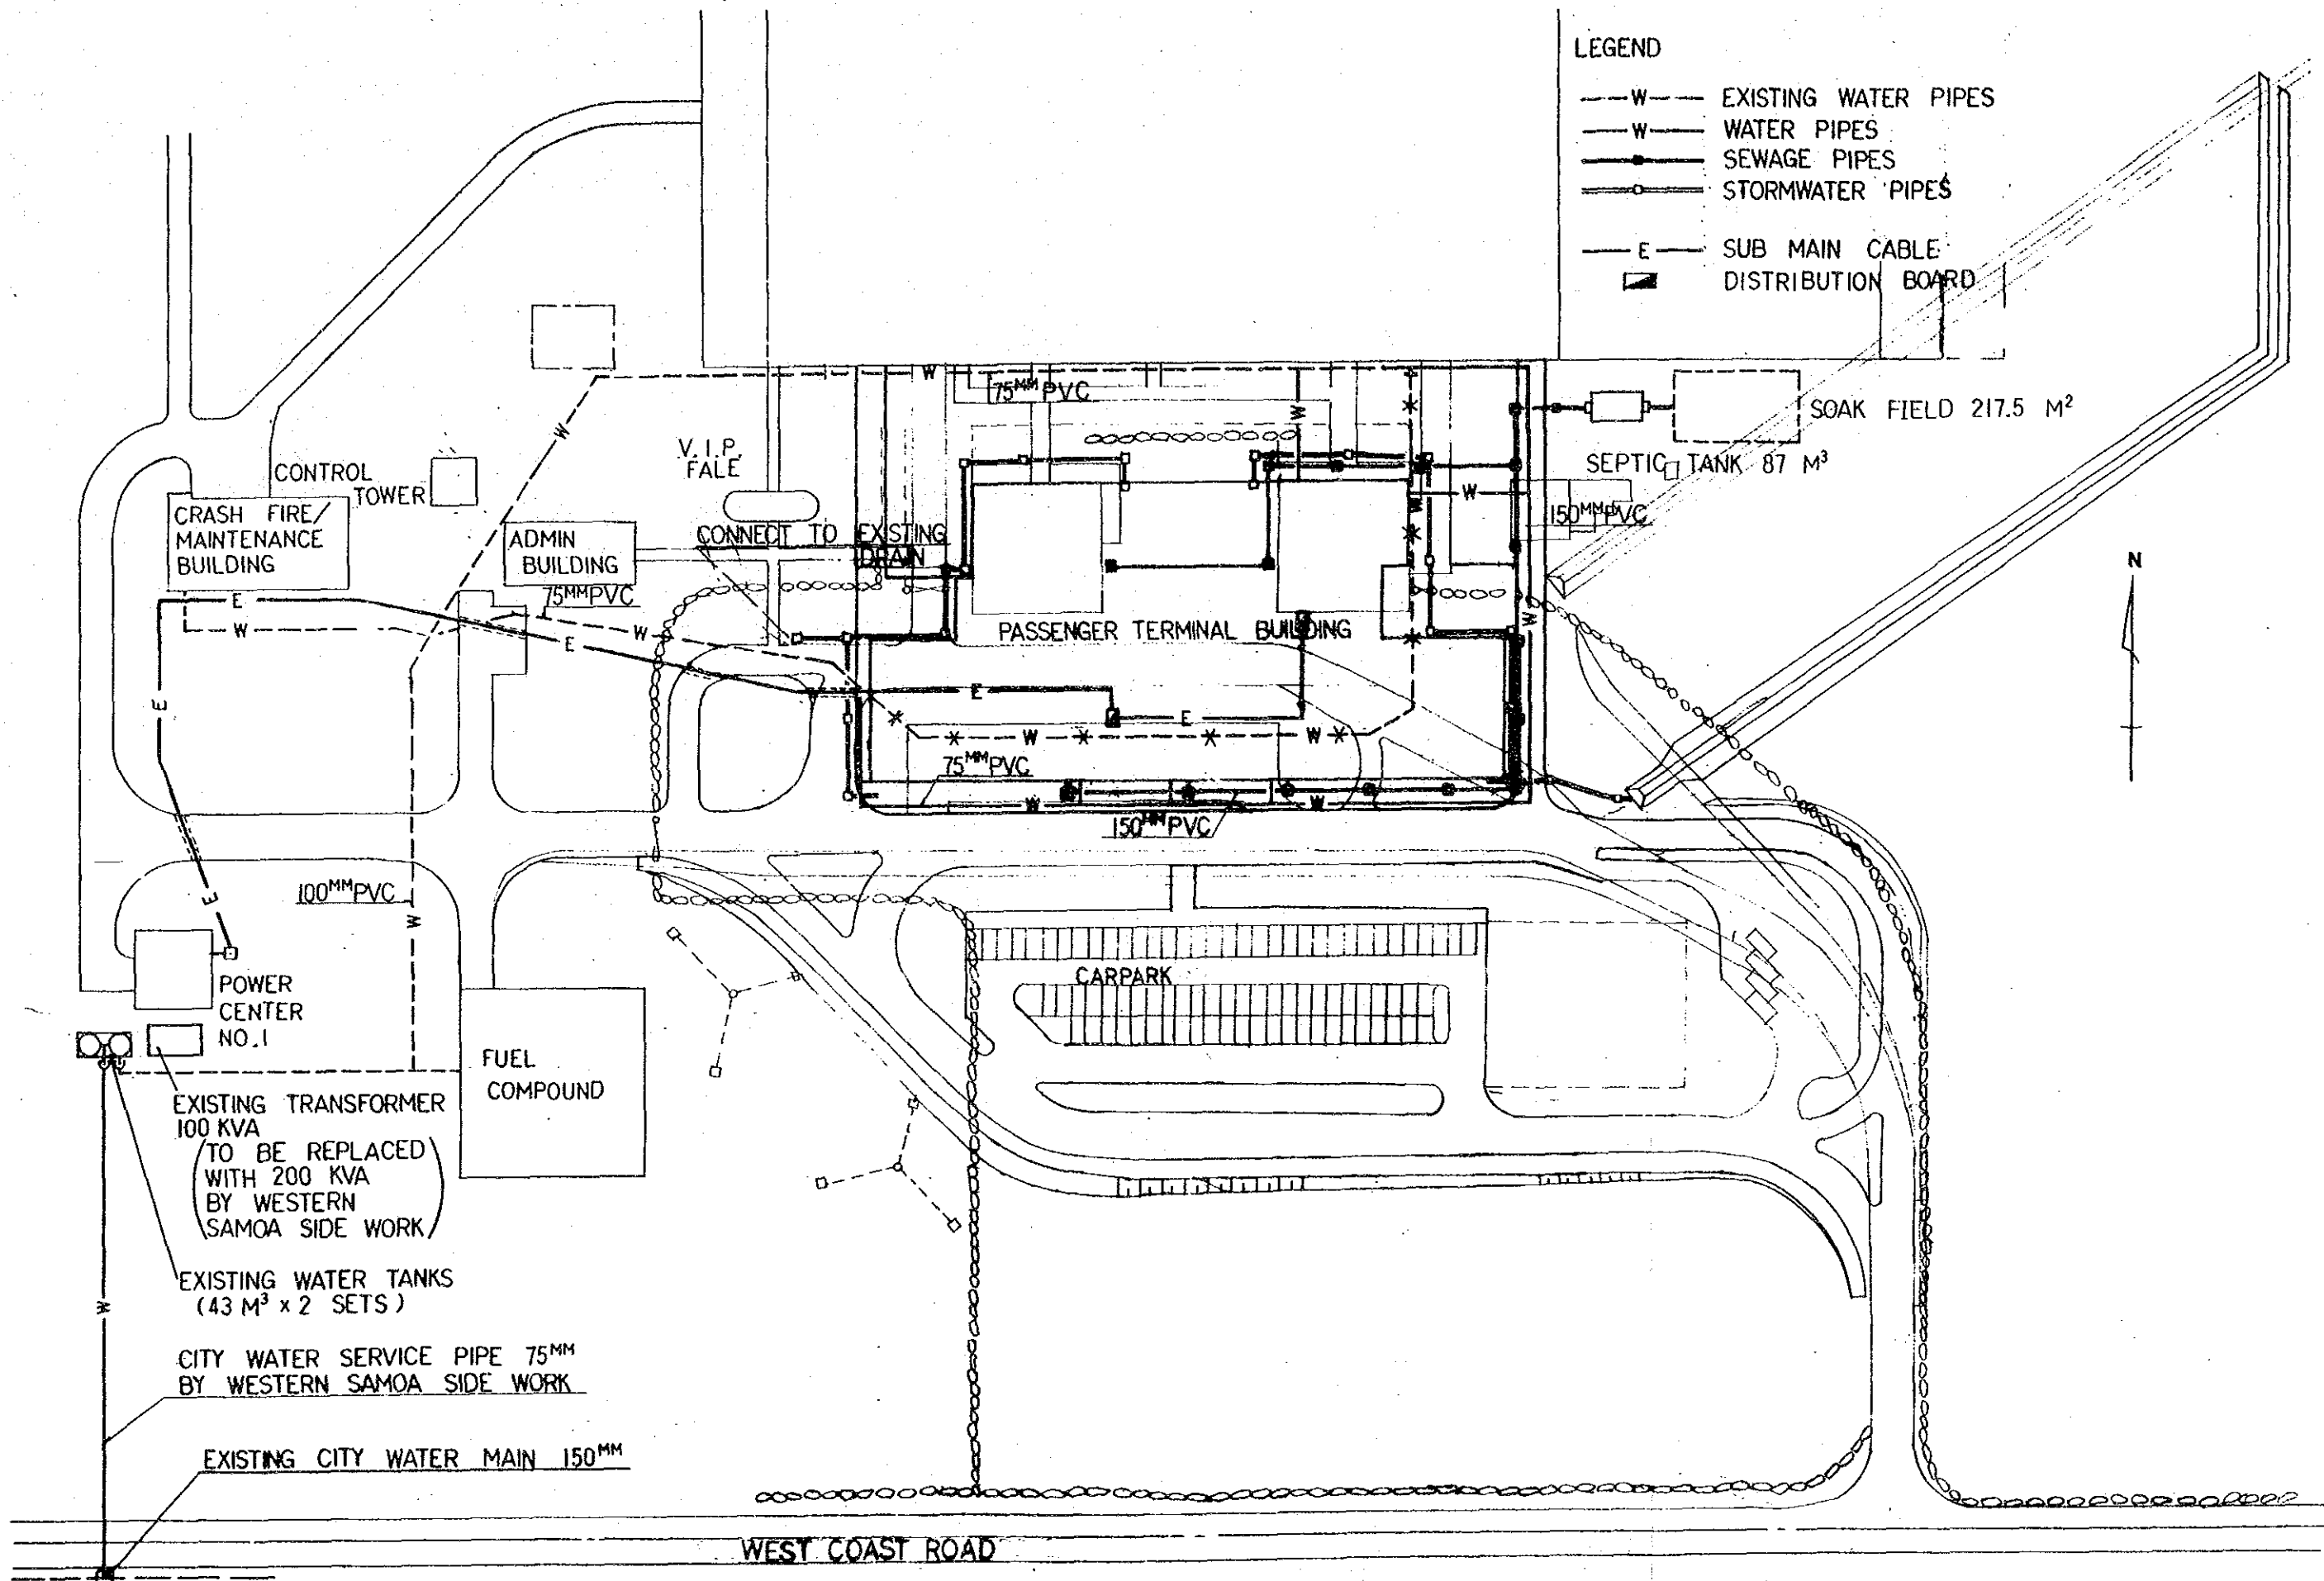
Water, Sewage and Electricity Main Plan
